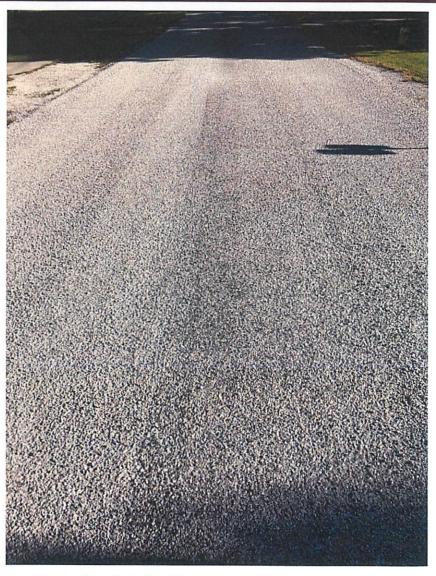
Existing Temporary Chip Seal Patching of Roadway Surface
